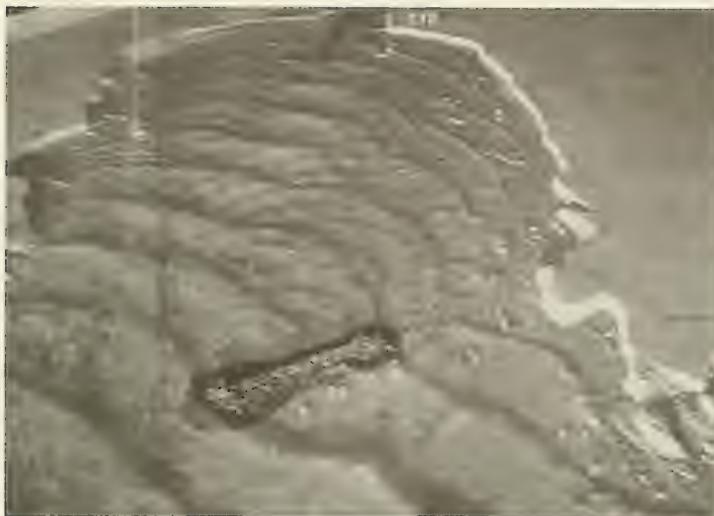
Typical wave patterns for the offshore breakwater plan; 9-sec, 20-ft waves from northwest; swl = 0.0 ft
